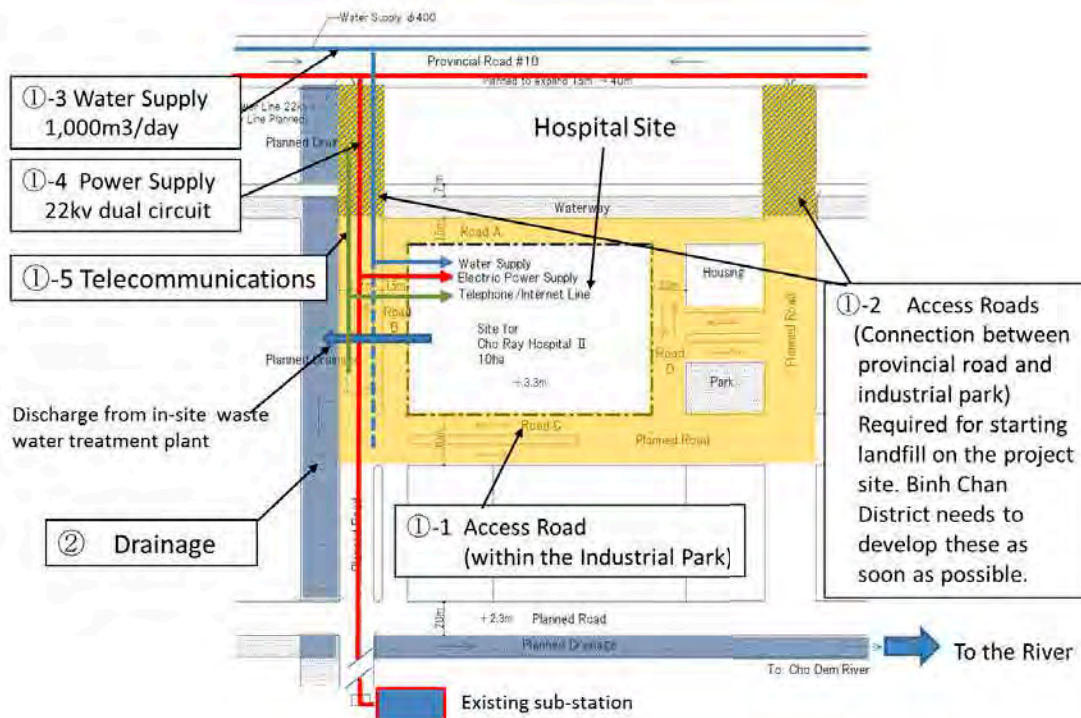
Minimum Necessary Development Works (Enlarged Plan)
